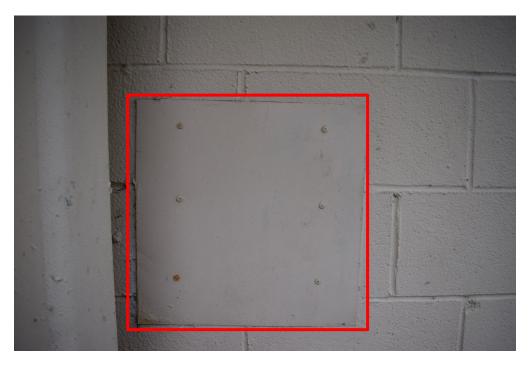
Close-up of the proposed insertion point of the French drain (outlined in red), located at the south end of the primary (west) façade of Building 49, facing east. Courtesy: ICF 2020.
